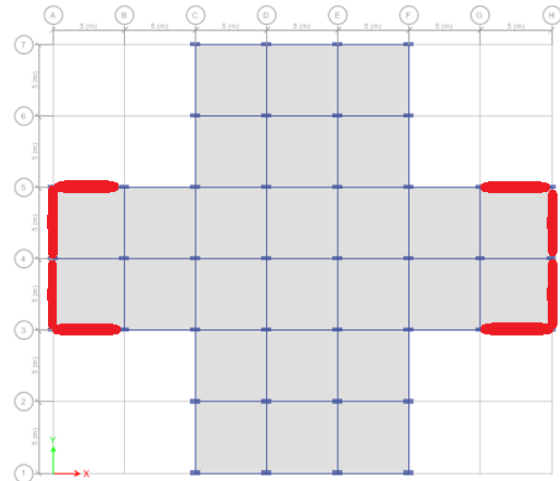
Plan of Model 2 (bracing locations are marked with red line)
